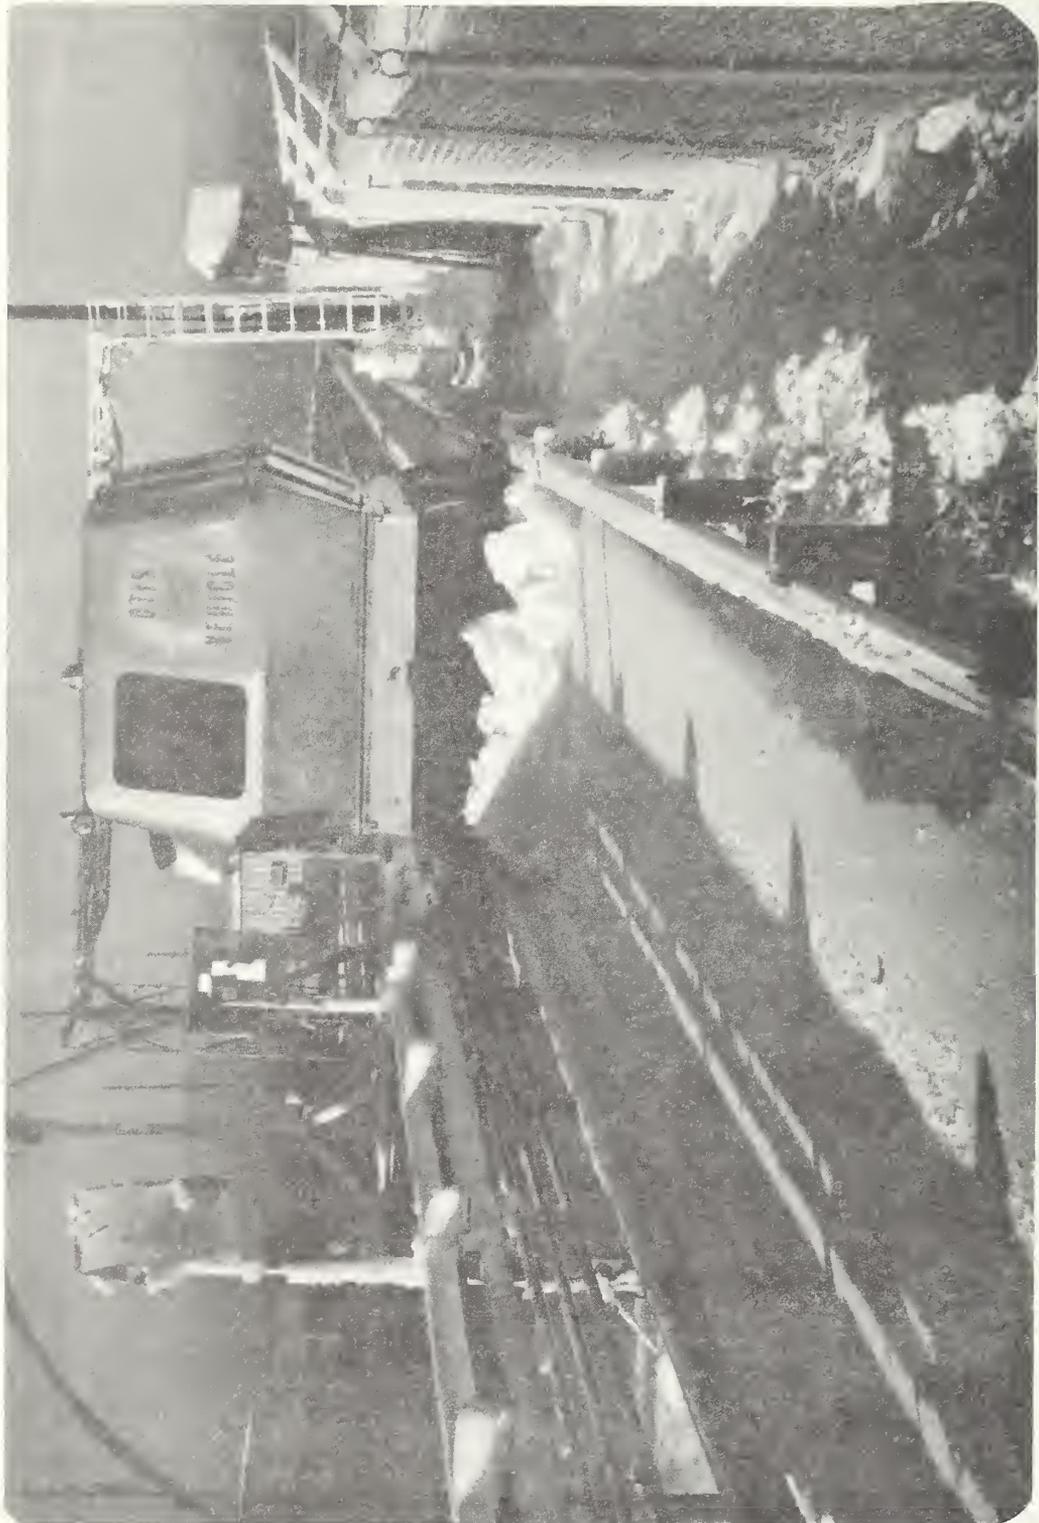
GUIDEWAY AT OTIS TEST TRACK
